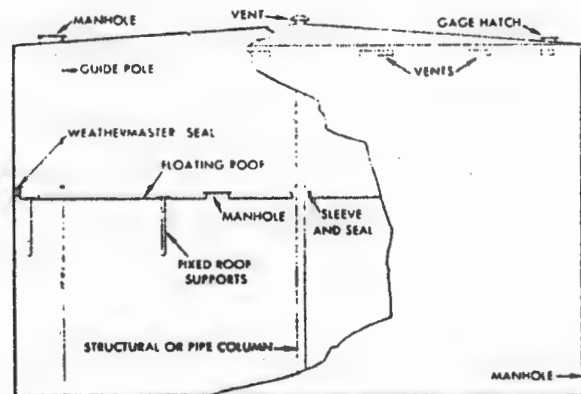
Cone Roof With Internal Floating Pan Storage Tank (Steel or Aluminum Pan) (Interior View).
